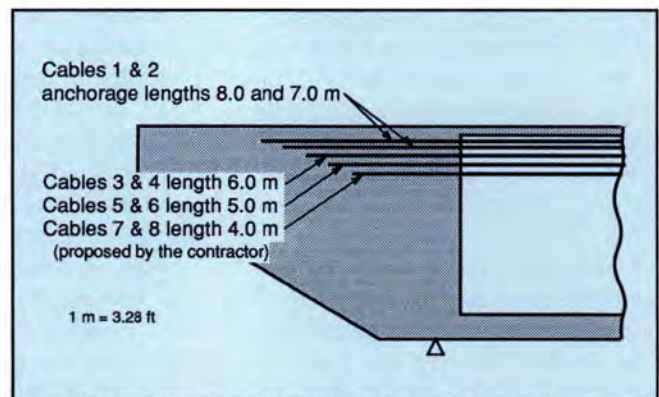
Dead-end anchorages in solid trapezoidal cantilevers.
